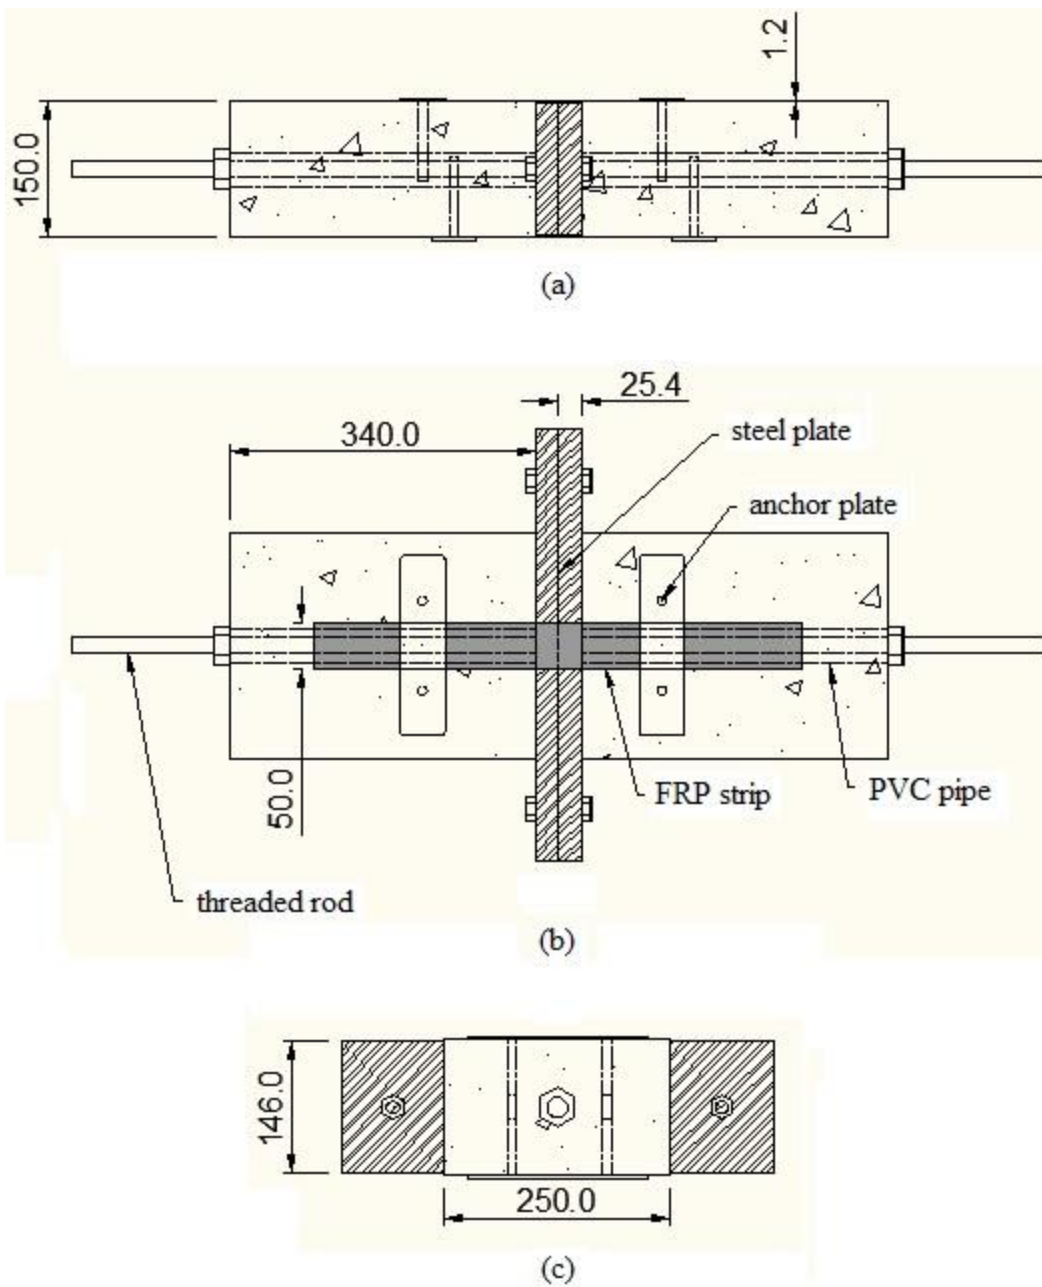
Typical specimen with one anchor per face (a) Elevation view, (b) Top view and (c) End view
